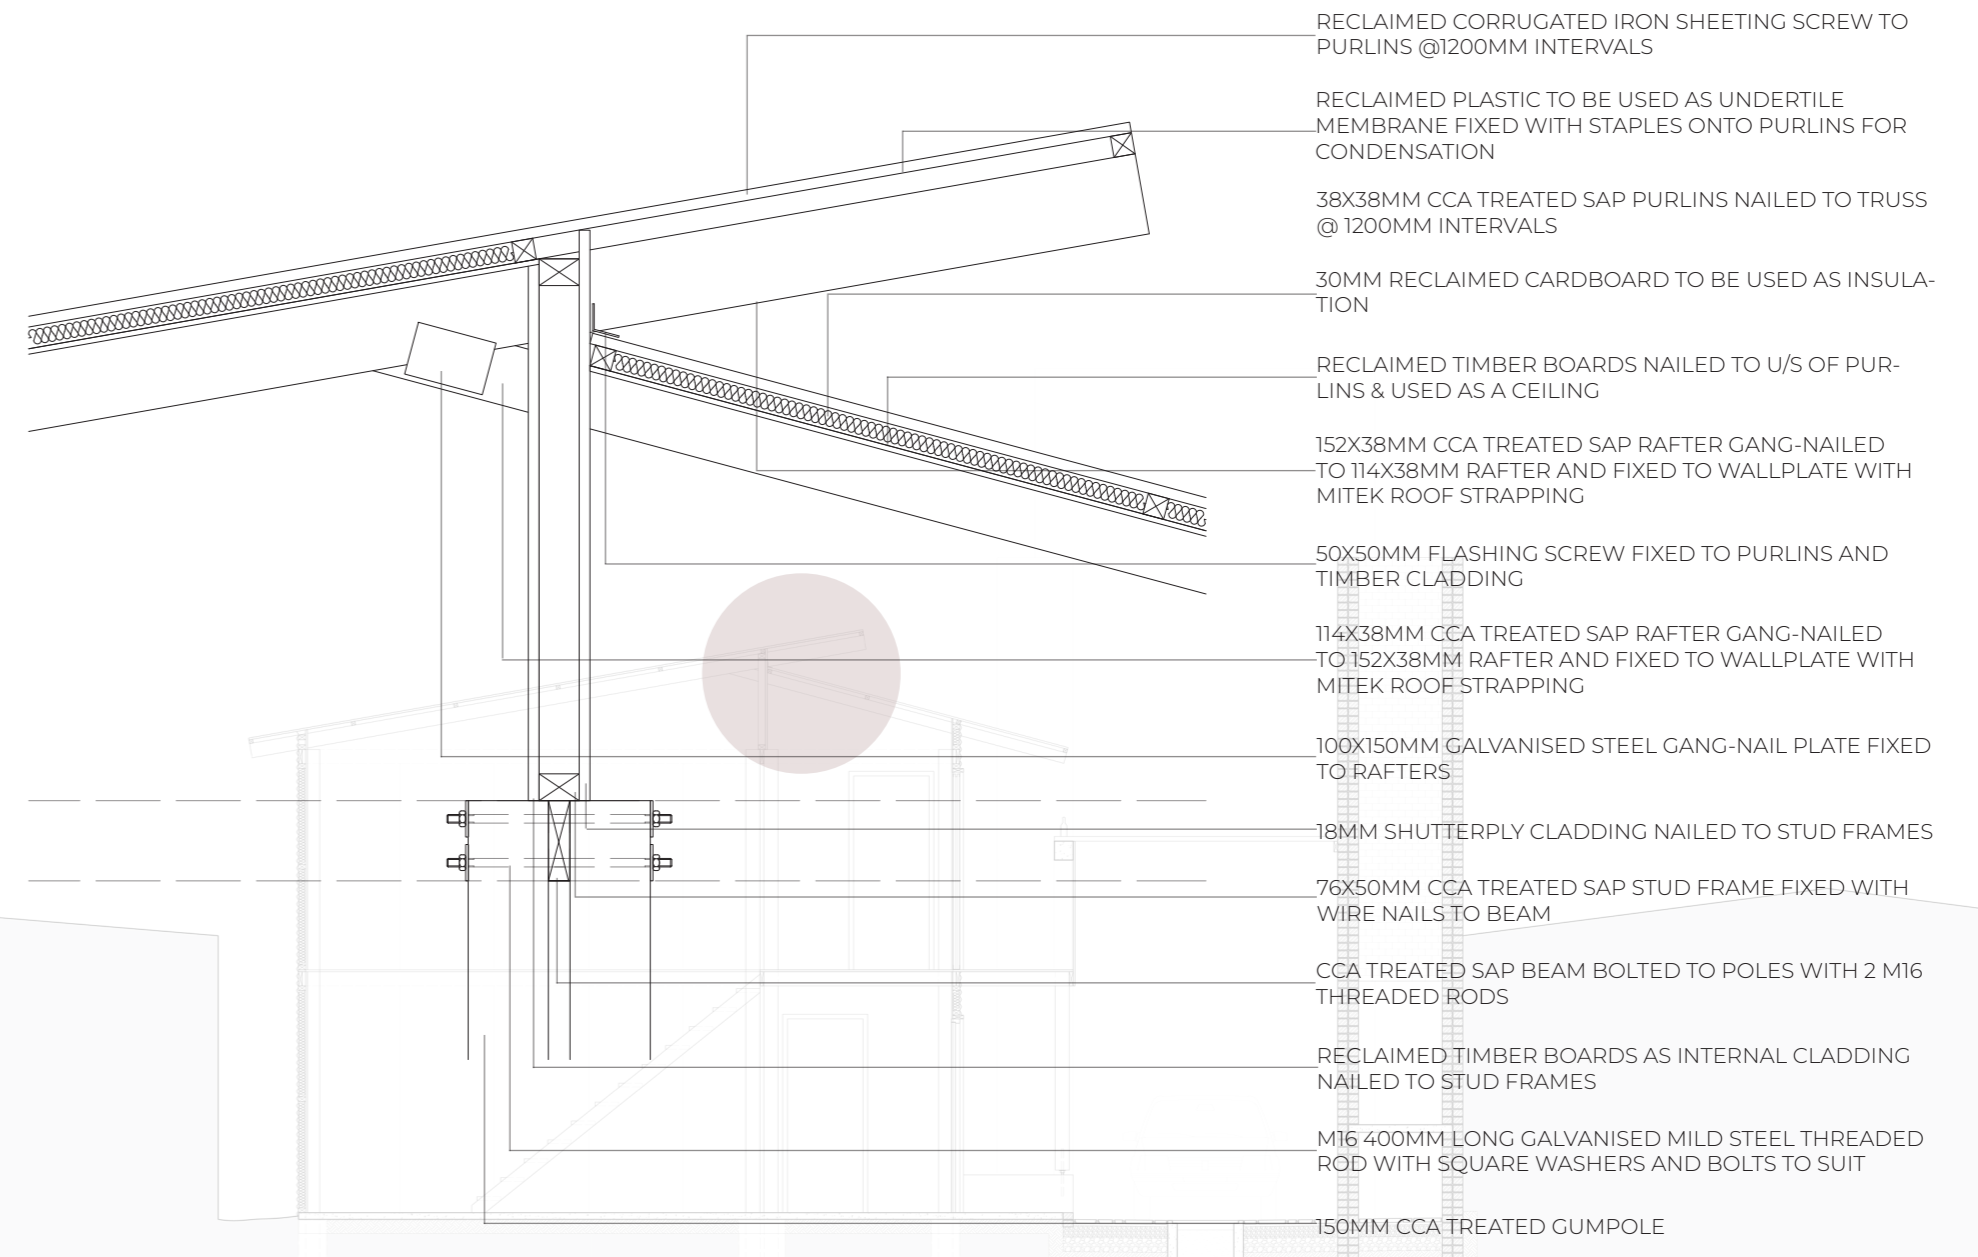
Detail 6 showing the wall and floor construction of Roy's dwelling (Author 2022)
